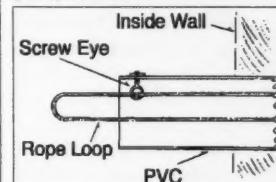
Side view of PVC pipe/cable raceway as it enters the building interior, showing the cable-pulling rope loop idea in the text.
